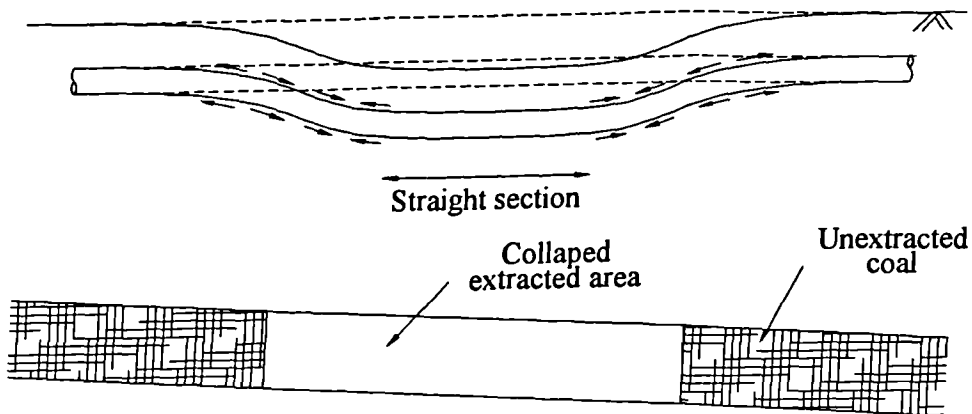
Ground and pipe deformation due to longwall coal mining.
